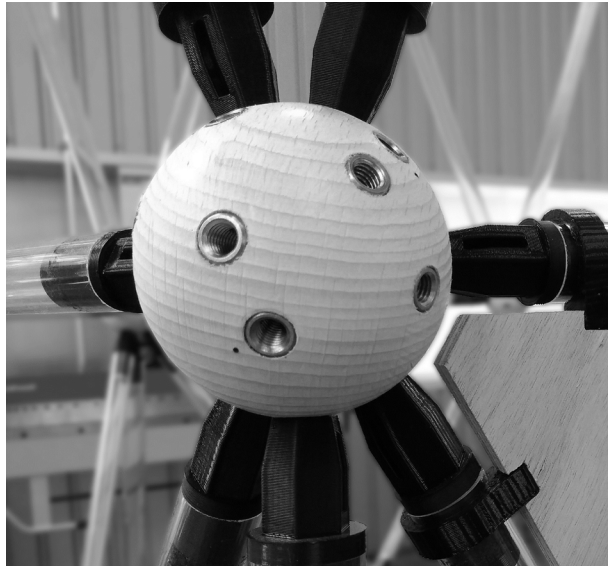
Detailed view of a spherical joint with attached tubes. Unused holes will be used in a different structure assembly.
